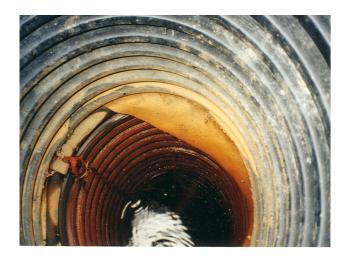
INTERIOR OF A WELL WITH PLASTIC CORRUGATED PIPE
